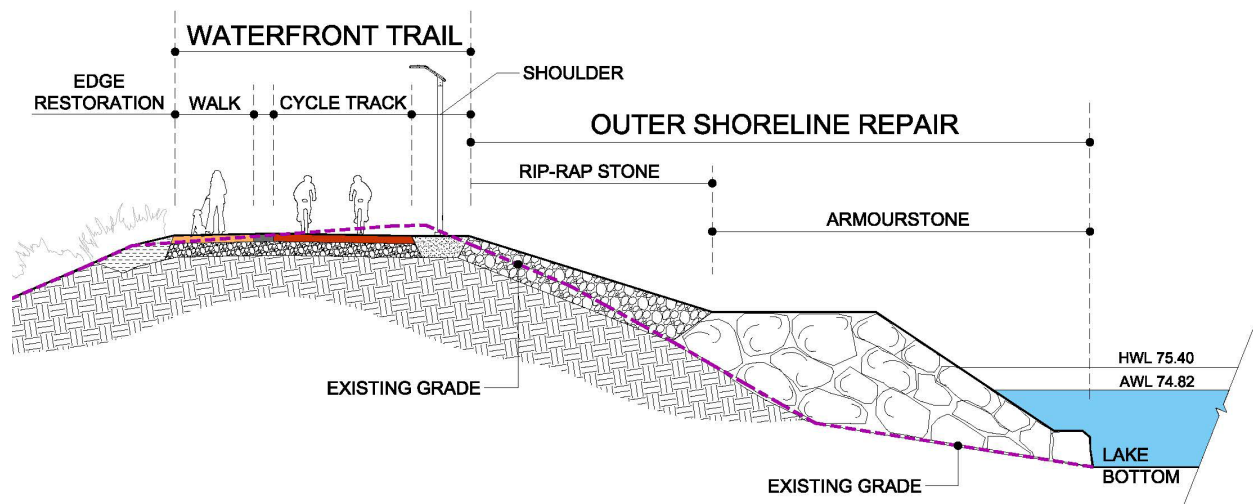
Conceptual cross-section depicting the proposed shoreline protection repair along the lake facing shoreline with adjacent proposed Waterfront Trail along the breakwater.
